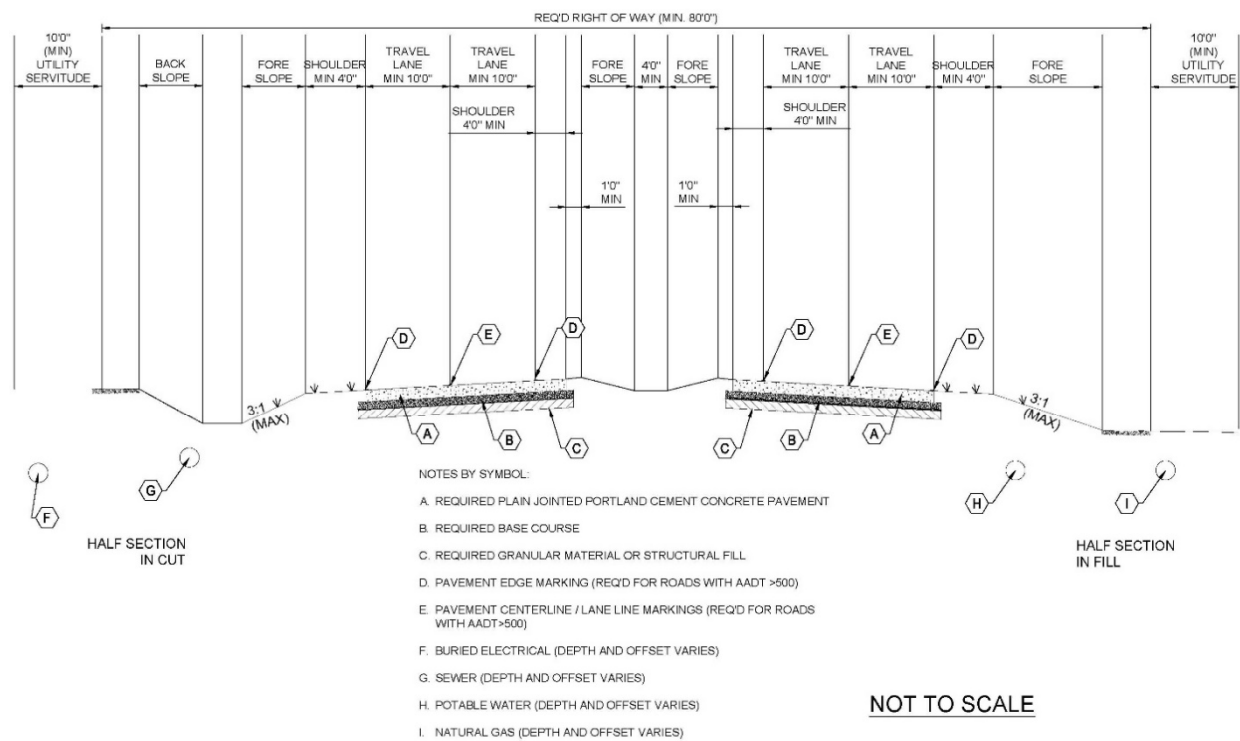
CROSS SECTION ELEMENTS AND REQUIREMENTS FOR UNCURBED ROADWAY, 4 LANES, PORTLAND CEMENT CONCRETE PAVEMENT
